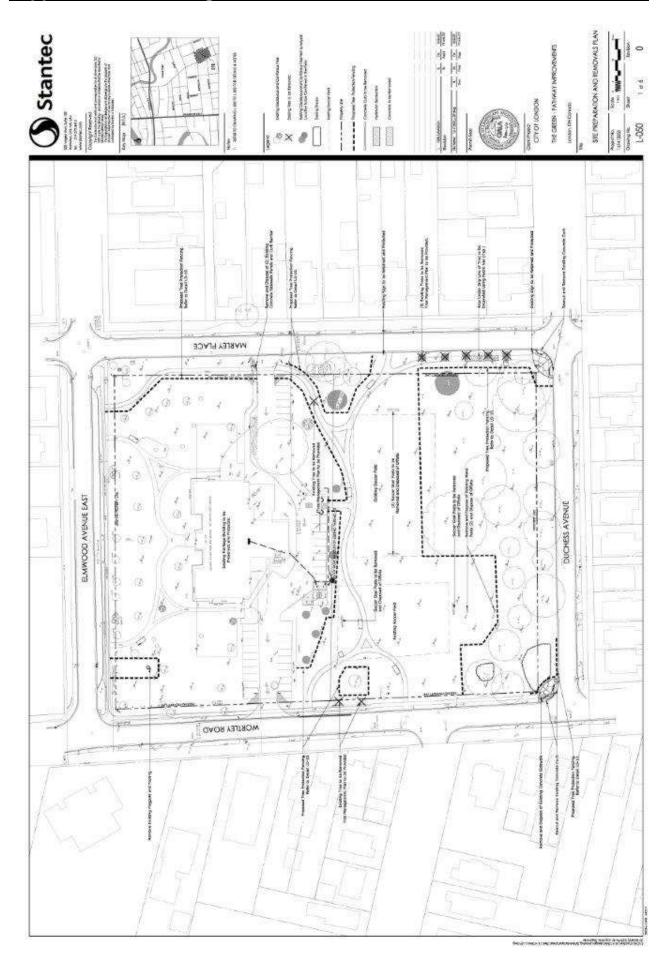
Drawing L-050: Site Preparation and Removals Plan (April 2, 2018).
